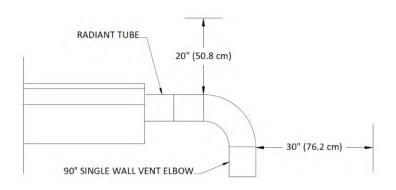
END CLEARANCES UNVENTED INSTALLATIONS
